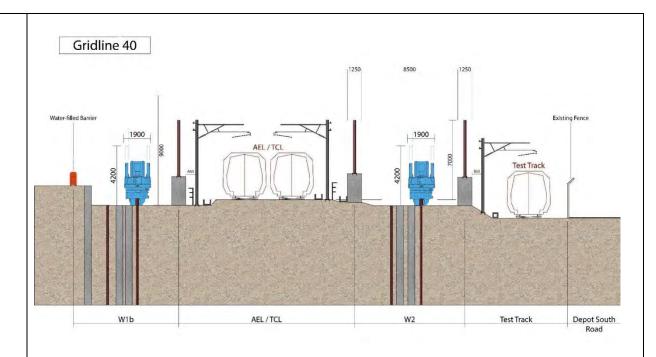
Sections at G.L. 40 with Silent piler
